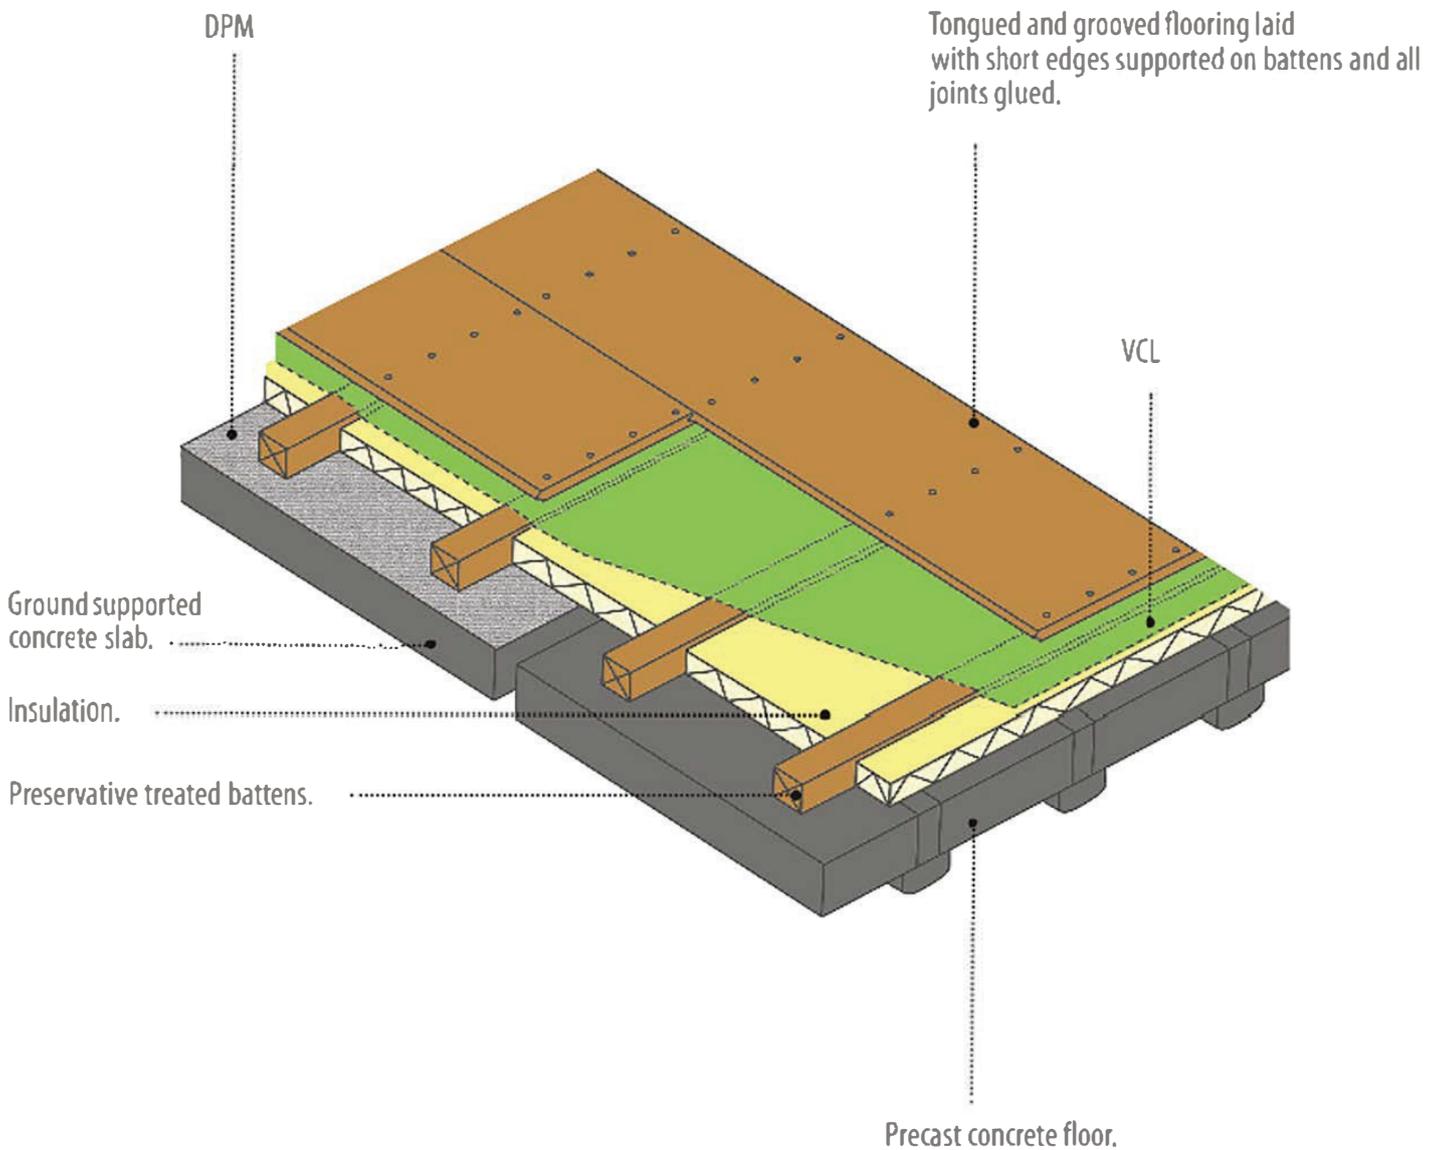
Self-supporting OSB or particleboard floating floor over ground supported concrete slab and precast concrete floor.
